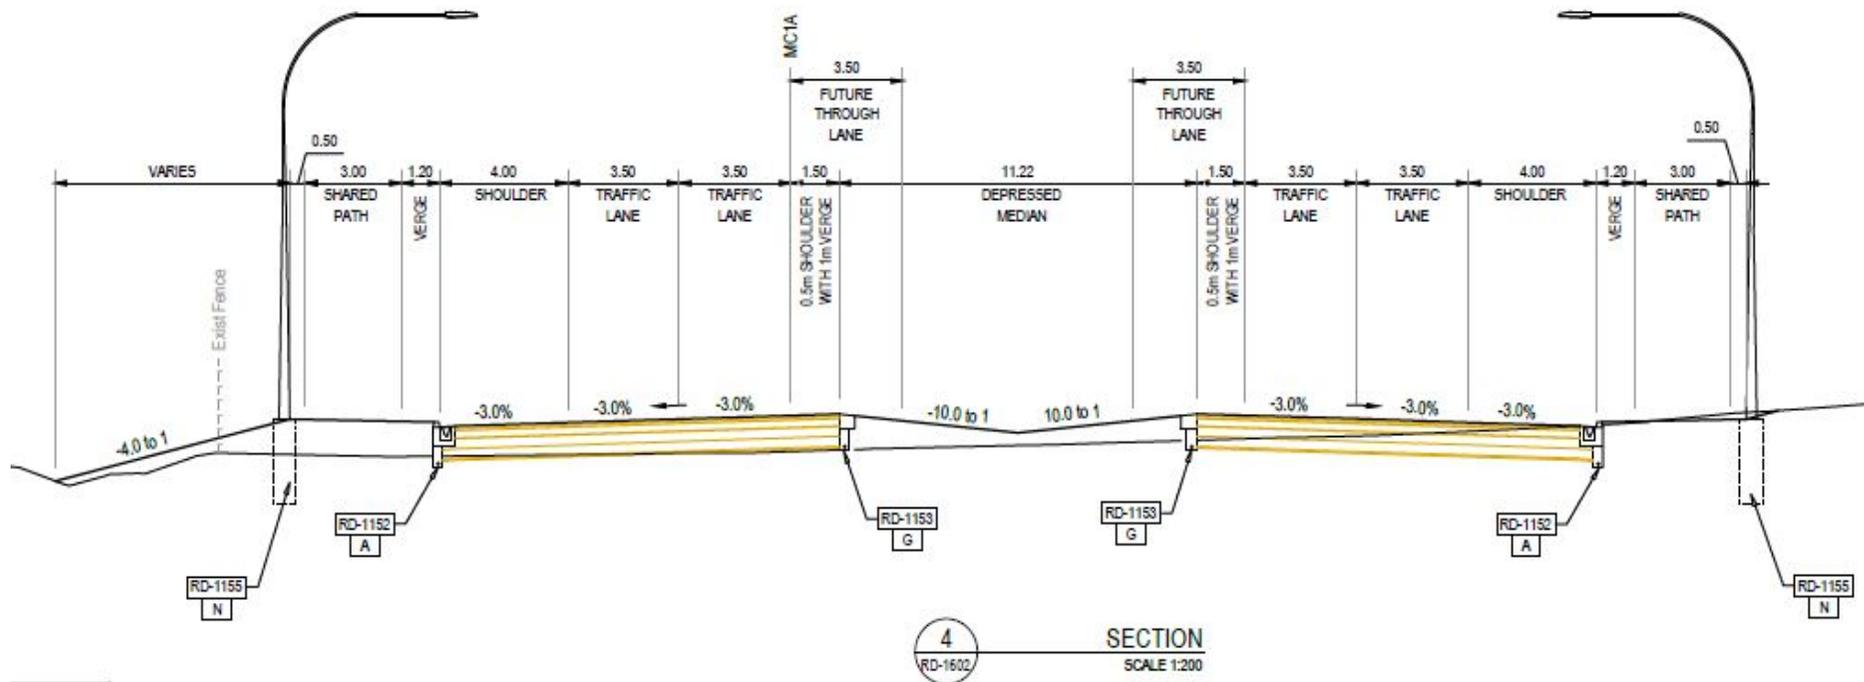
Typical cross section - The Northern Road (about 700 m south of Bringelly Road)
